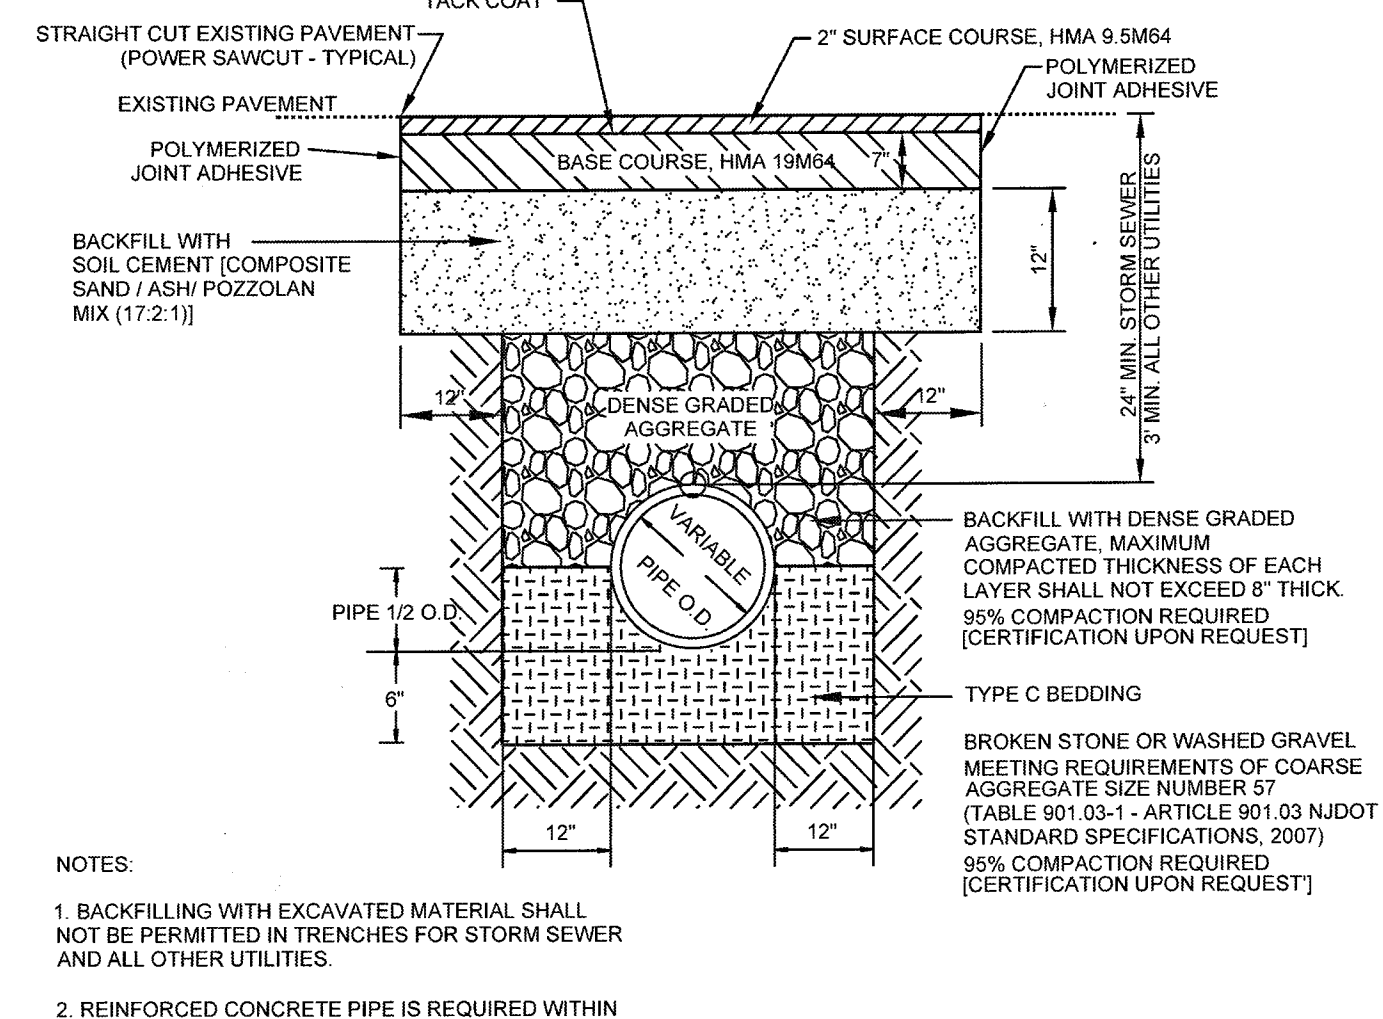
HOT MIX ASPHALT PAVEMENT DETAIL
